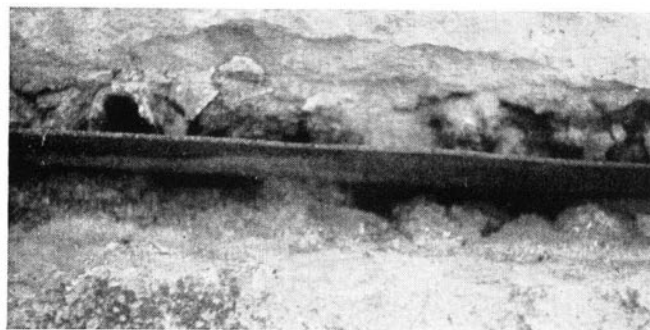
BAD SPALLING ALONG J-4 CONTRACTION JOINT
